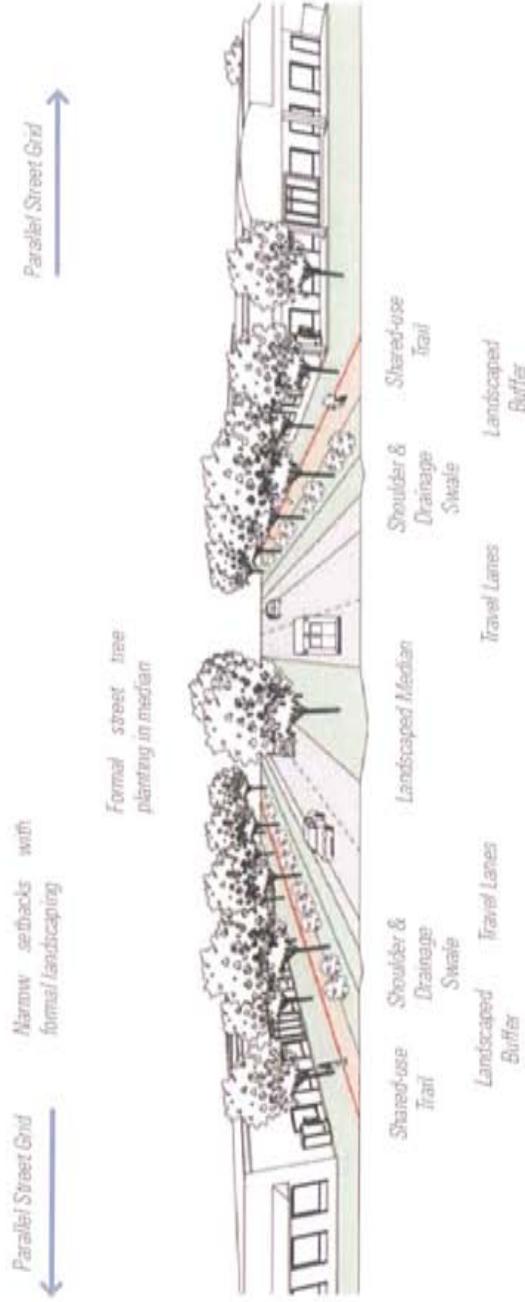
Tyler Road looking north at Comfort Inn - potential future condition.
